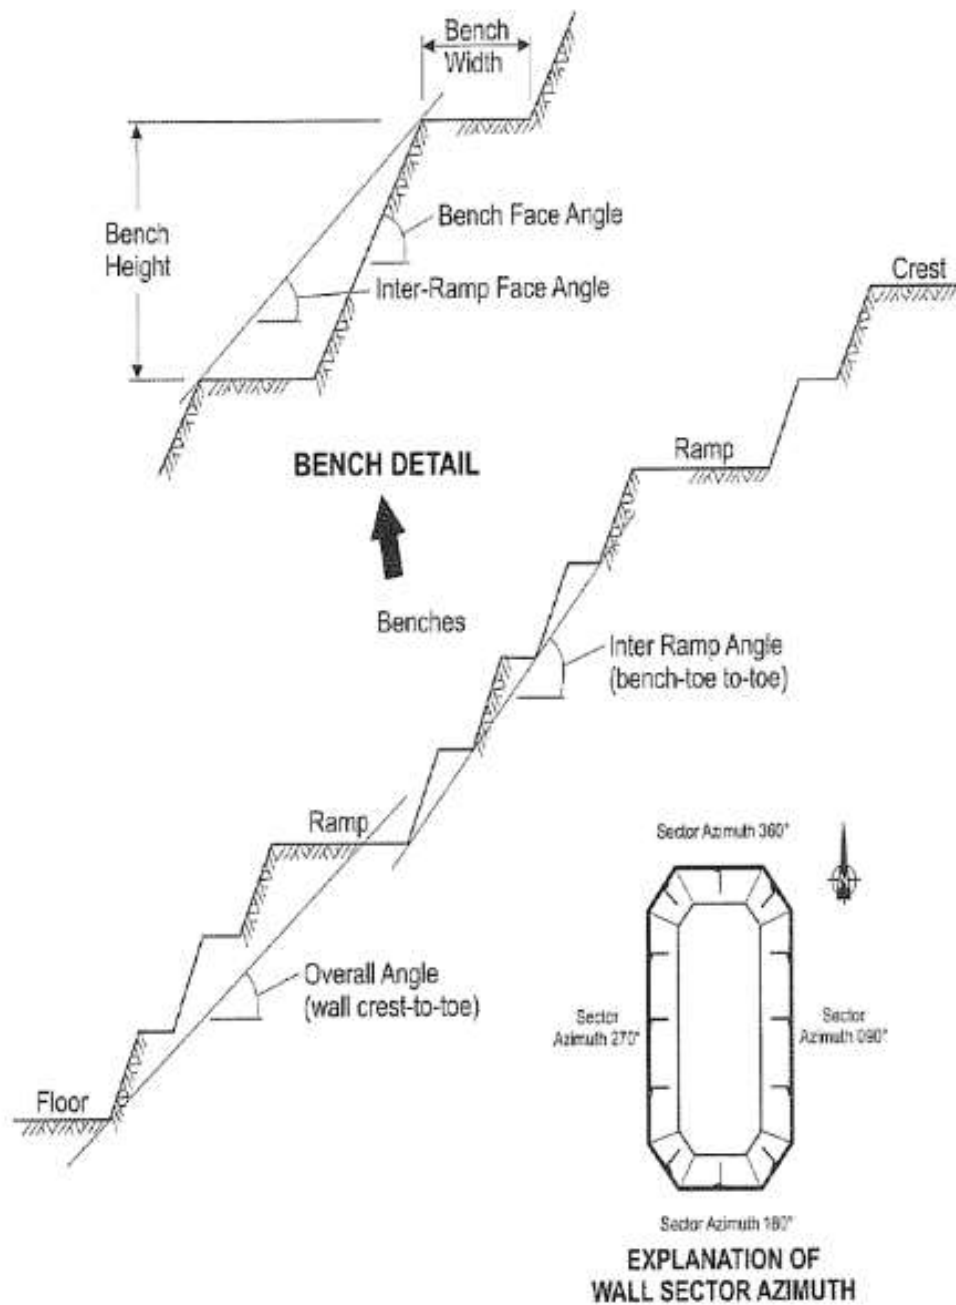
Open Pit Highwall Terminology (Michaud, 2018)
